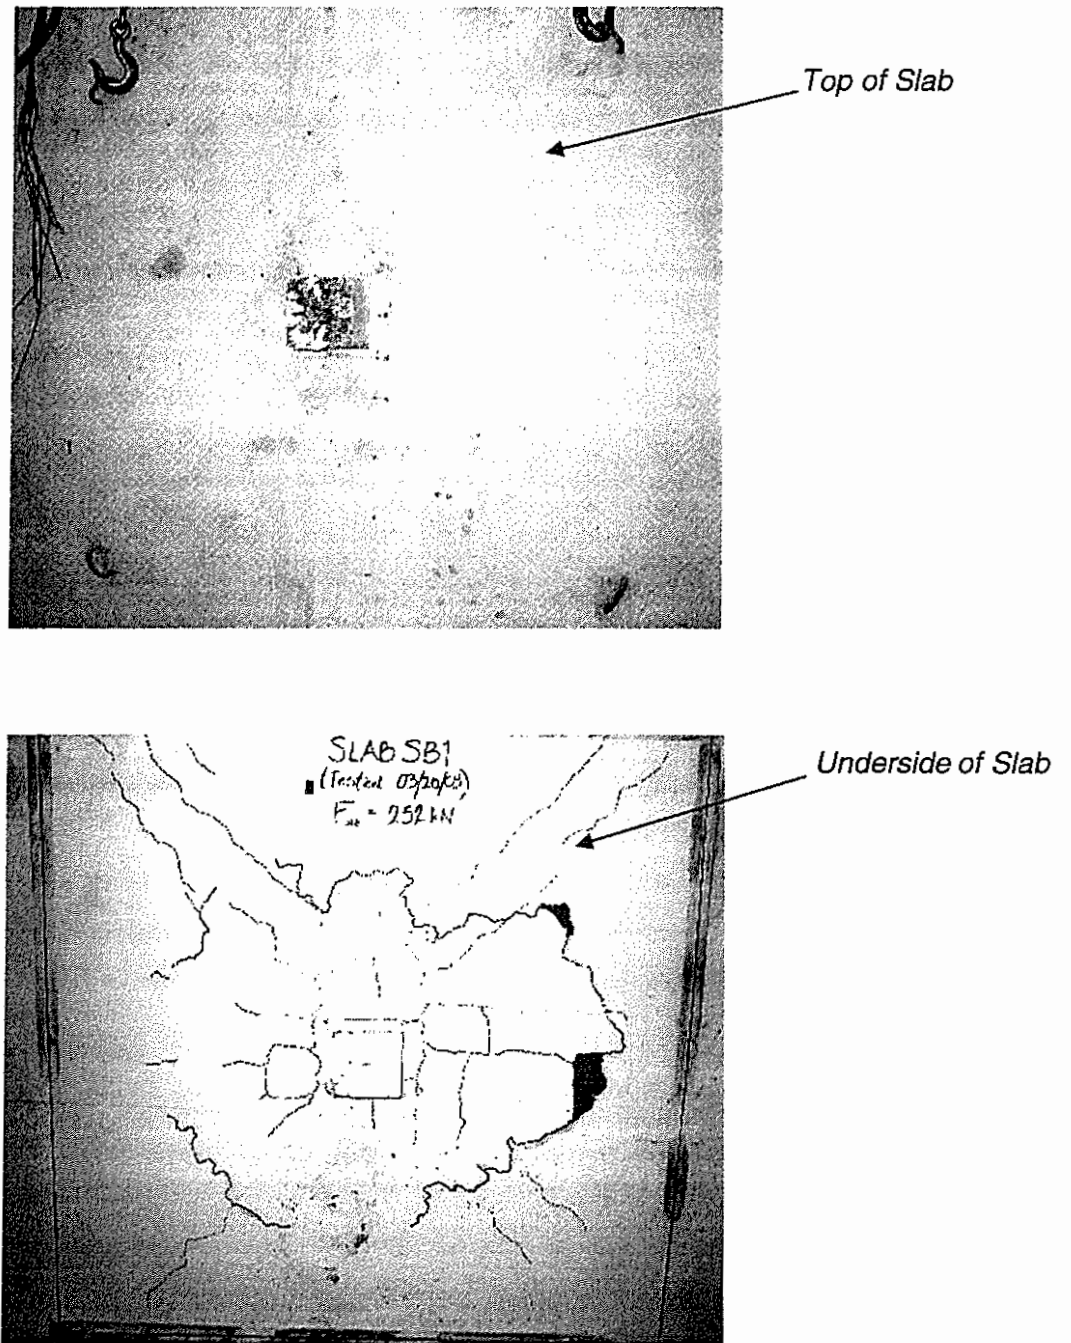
Crack Pattern after Failure of Specimen SB1
